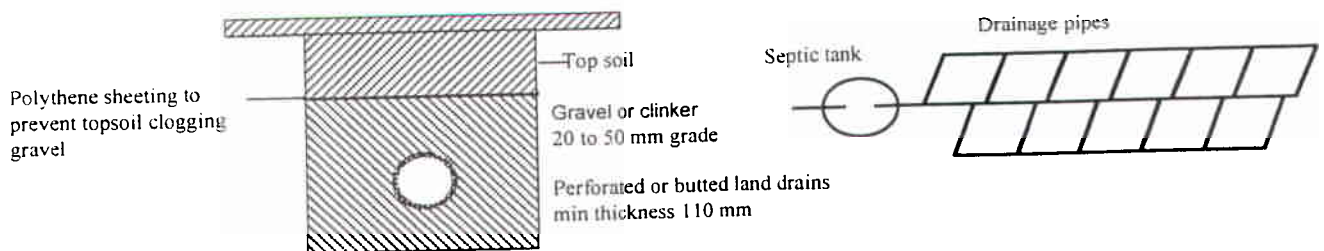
Typical layout of the drainage pipes in gravel-filled trenches and 'herringbone' drainage system
